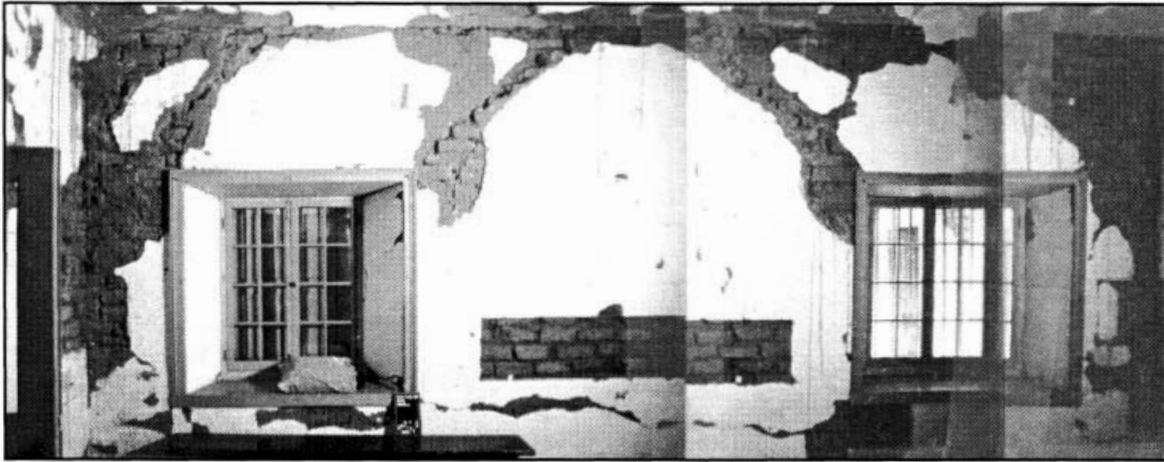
Interior elevation of the east wall of Room 8. This wall was repaired in 1991 with an adobe-flyash grout and appears to have suffered little additional damage in the Northridge earthquake.
